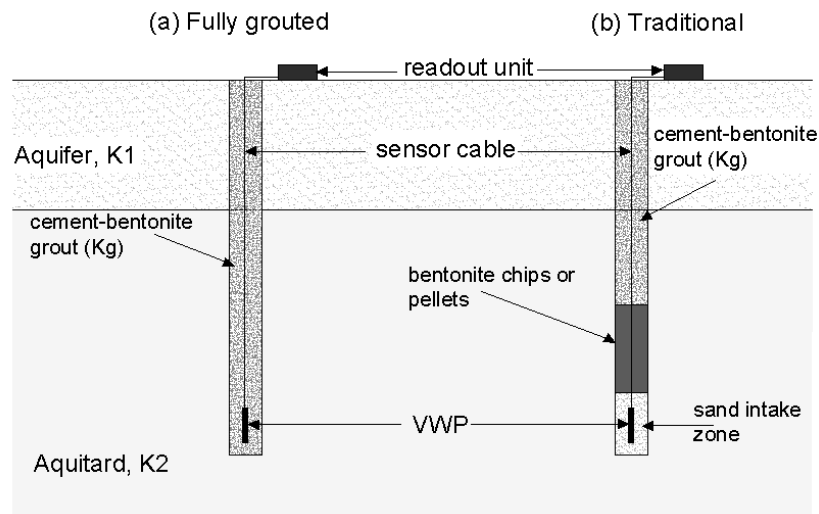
Vertical sketch of VWP installation: a) fully grouted method; b) traditional method.
